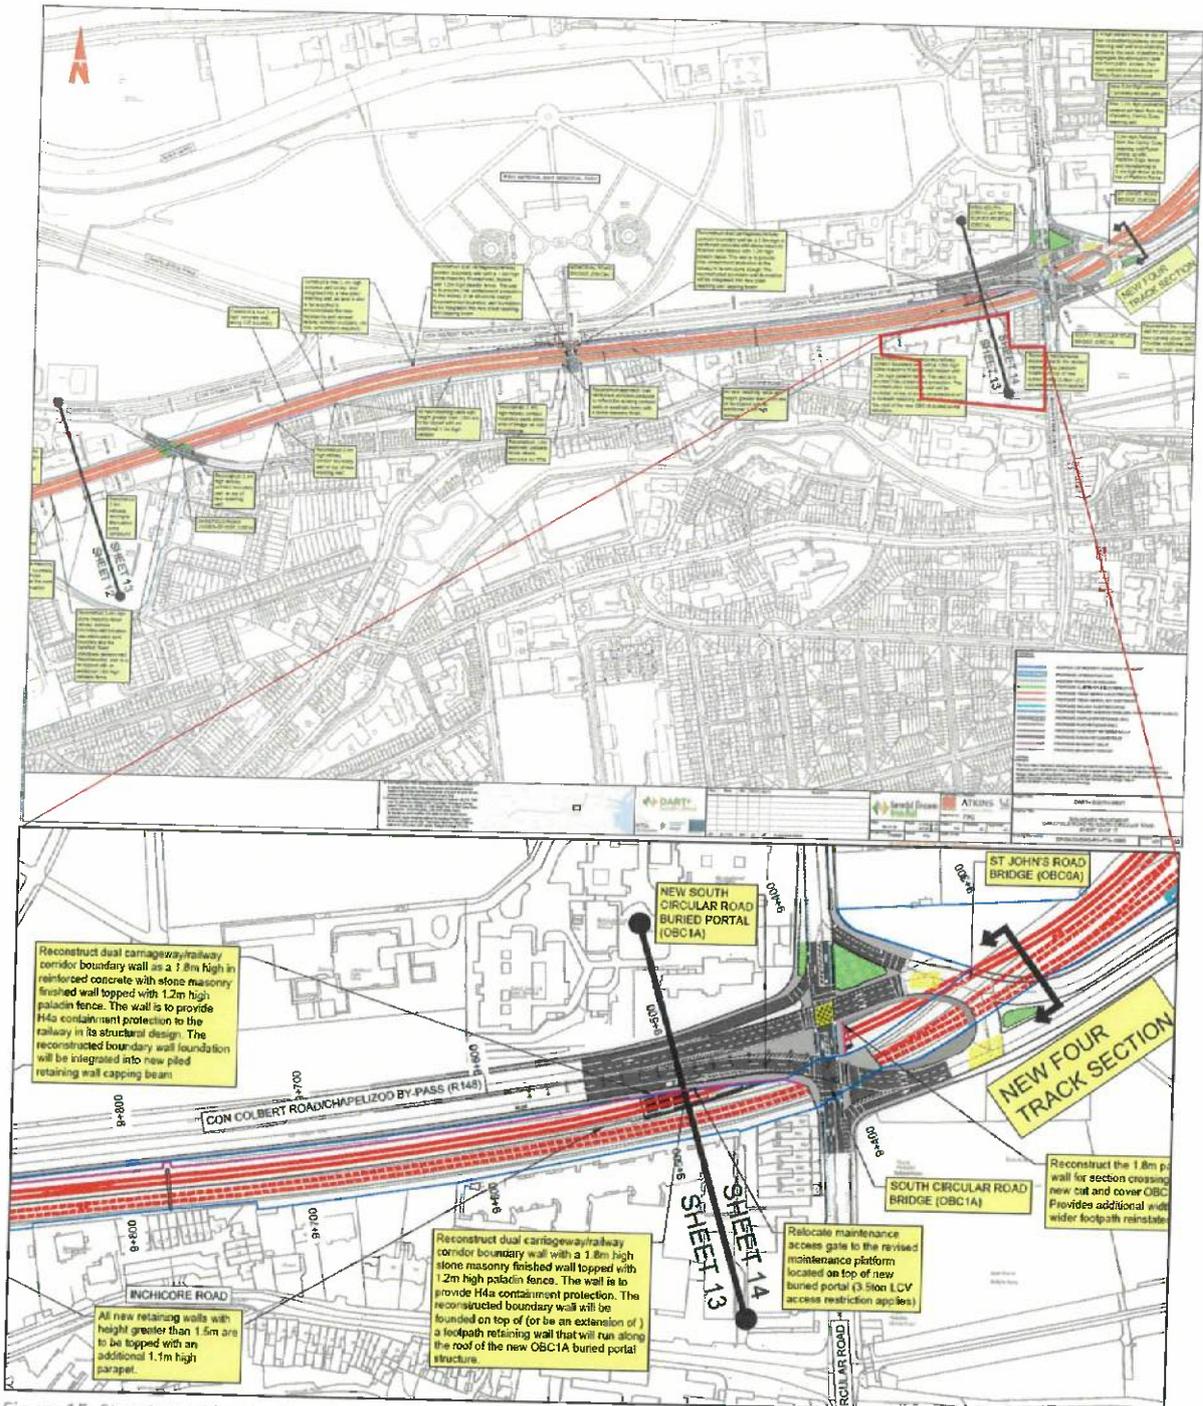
Structures Plan for the section of the railway adjacent to the subject property (drawing DP-04-23-DWG-RO-TTA-18898)
